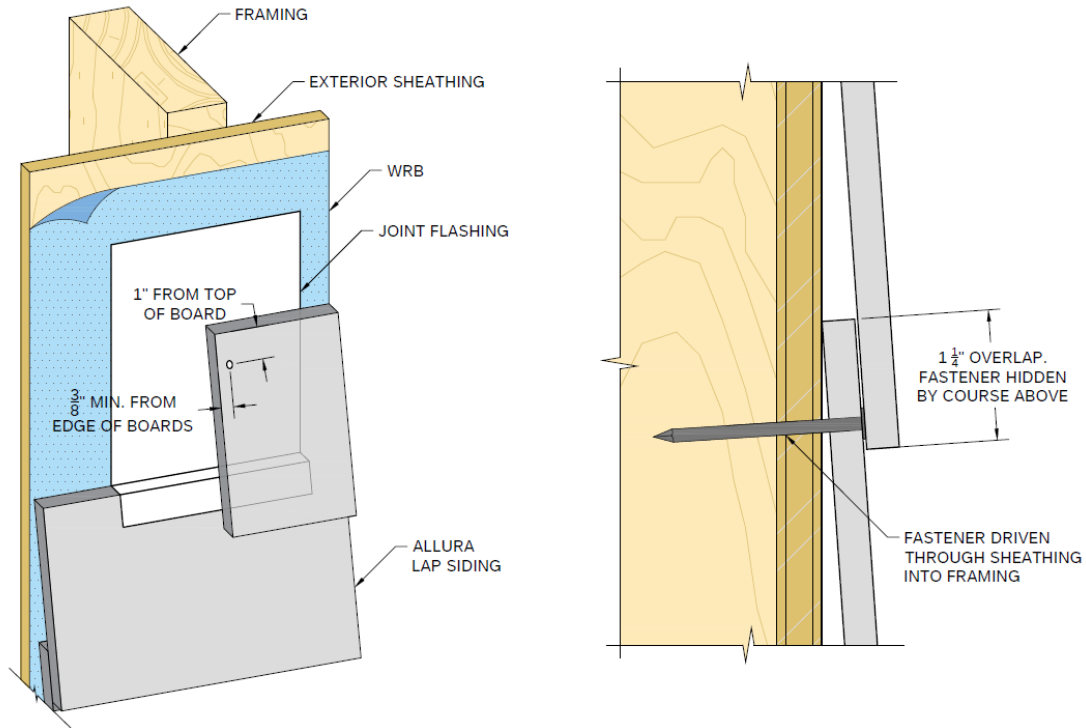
Allura® and TerraPlank™ Lap Siding Blind Nail Fastening Details
